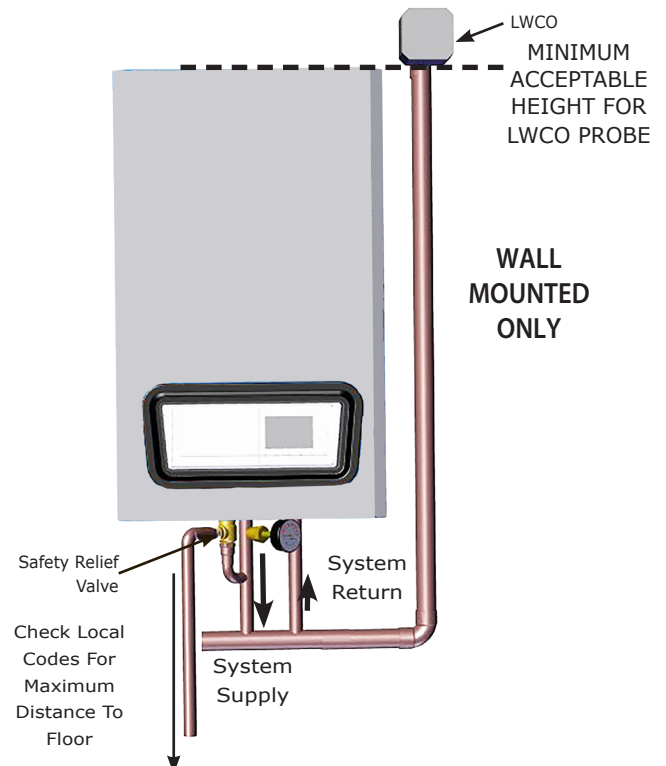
Manufacturer Recommended LWCO PROBE Location - 240 Boilers
